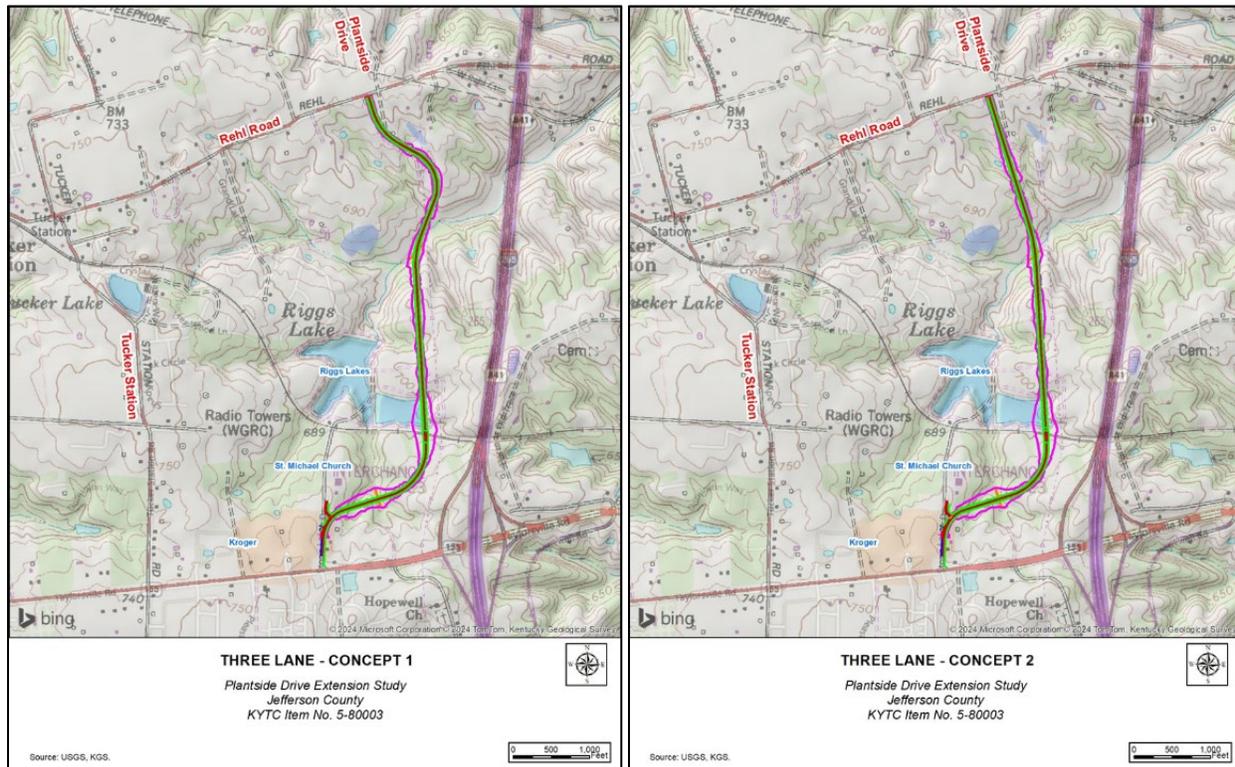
Plantside Drive Extension – Concepts 1 and 2
